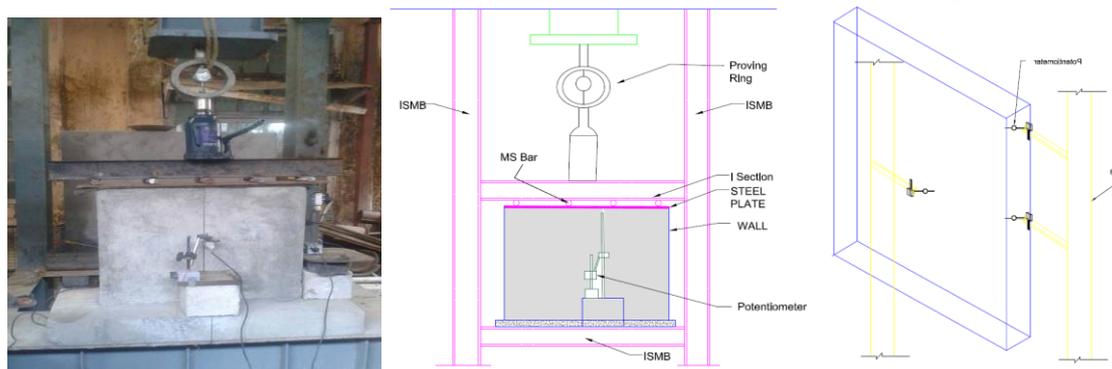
Assembly setup for axial load test showing loading arrangement and placement of linear potentiometer
